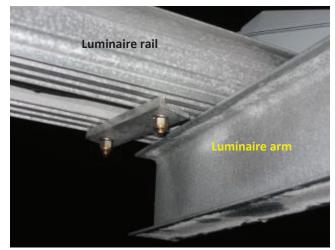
Loose luminaire rail clip at rail to luminaire arm connection
